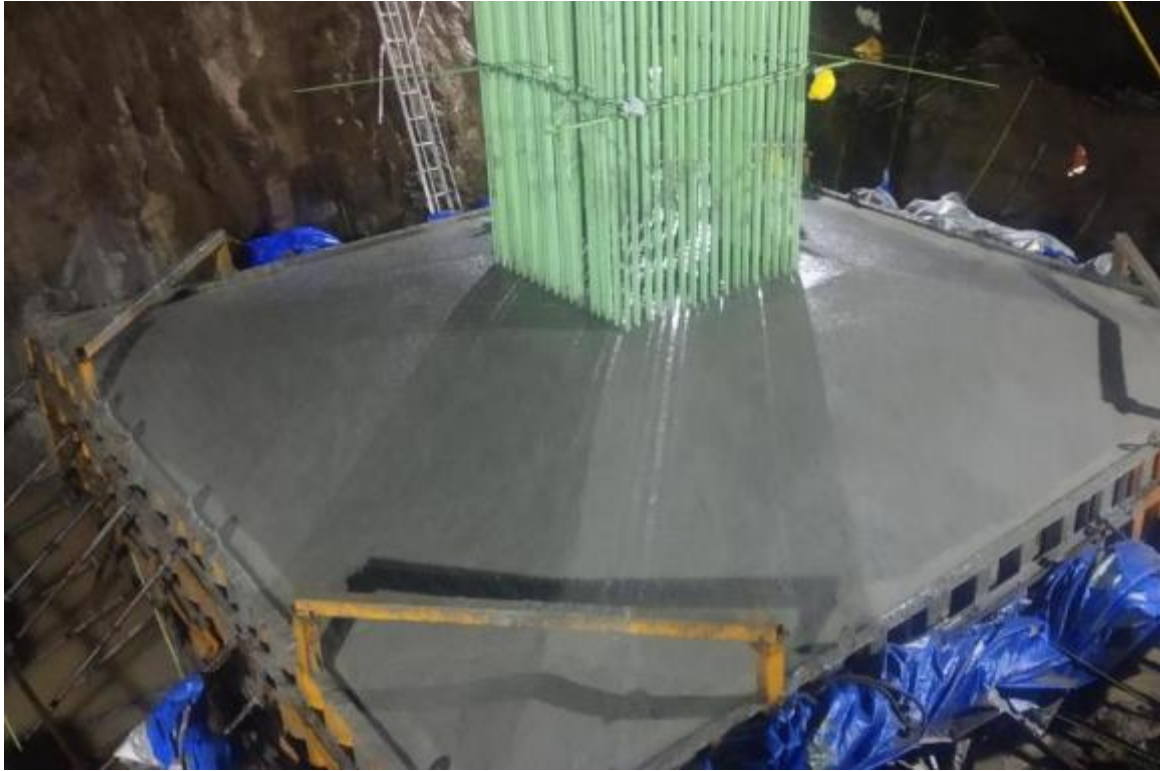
Concrete pouring at Foundation No. LP 38, Chirle completed
